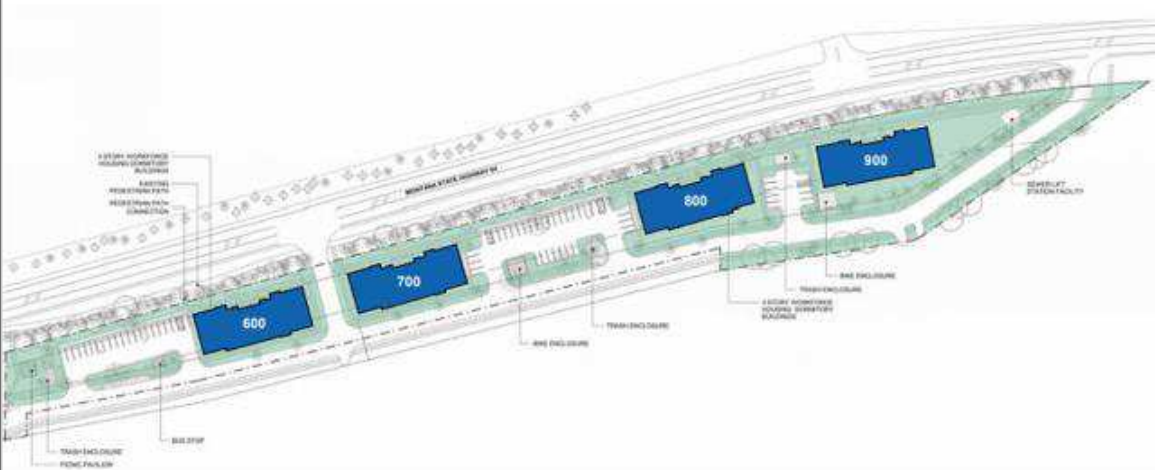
Buildings 600-900 (3 buildings – building 900 removed from study)
